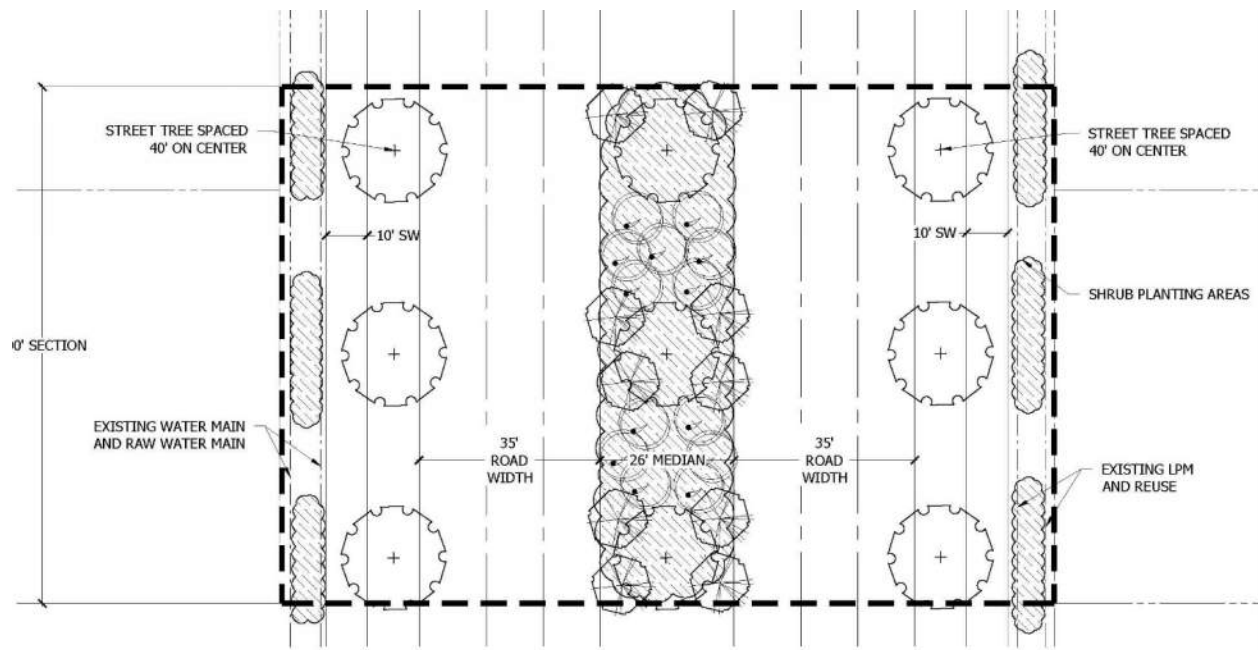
Typical 100-foot Plan View Section of Enhanced 150-foot Right-Of-Way
